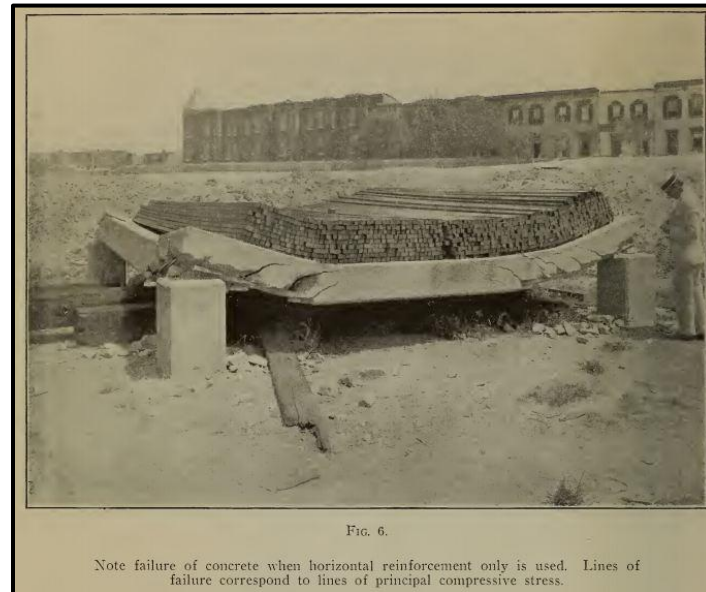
Concrete Failure Using Traditional Methods of Reinforcement.
